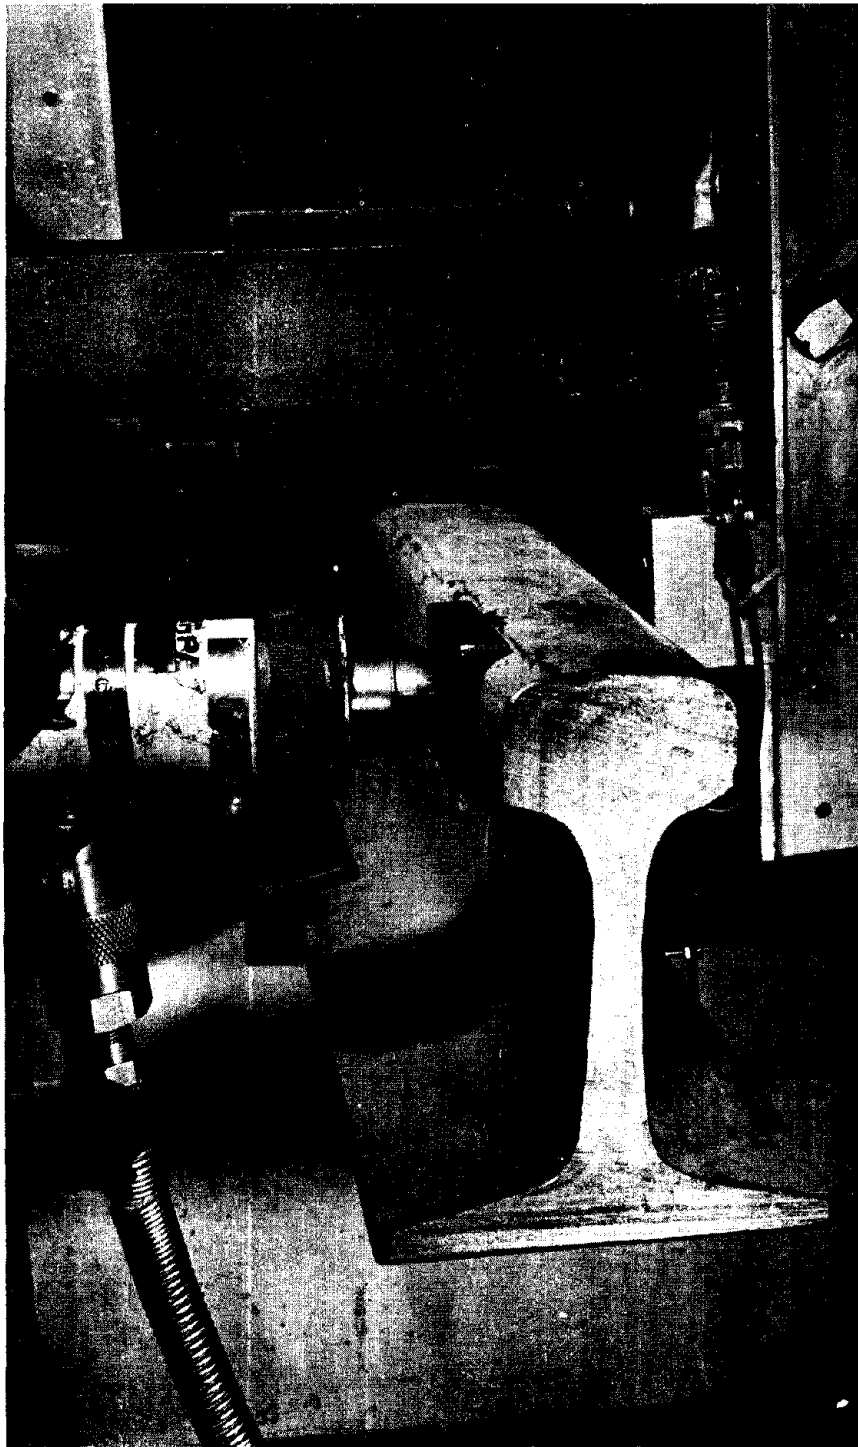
Test Set-Up for Fastener Resistance Test on Concrete Ties About the Vertical Axis, Showing Load Application Arrangement and Instrumentation.
